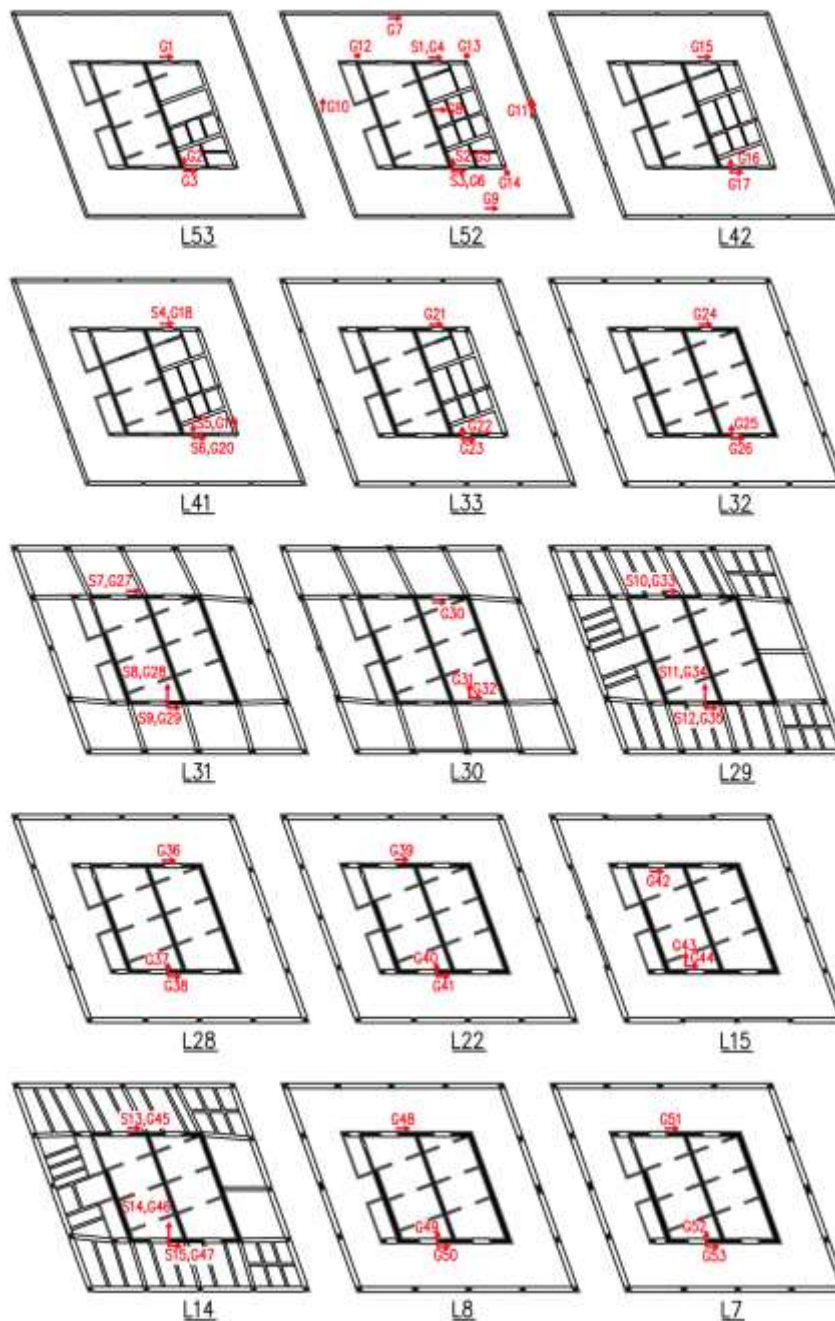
Plan views of the floors where accelerometers are deployed through the building.
